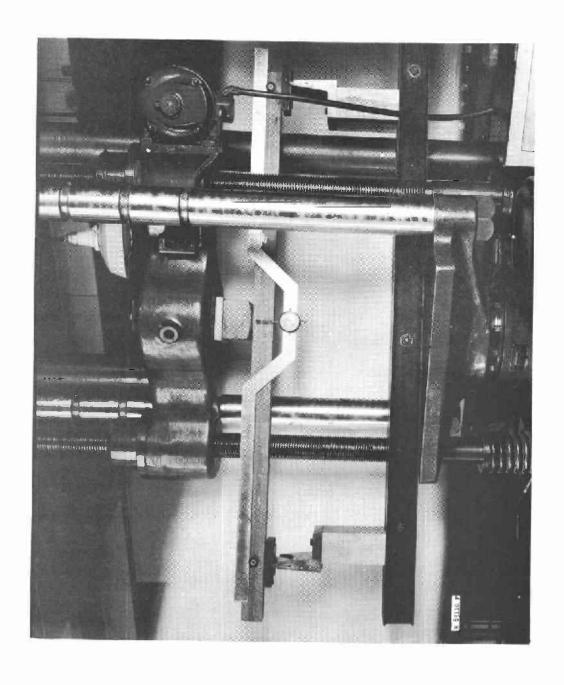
Method of conducting transverse tests of 2.0- by 2/6-inch by 6-foot straight controls over a 62-inch span, showing: the 8-inch radius bearing block rigidly attached to the head of the testing machine; dial attached to a yoke for measuring center deflections corresponding to load increments; roller bearings over the knife edges at the supports.
